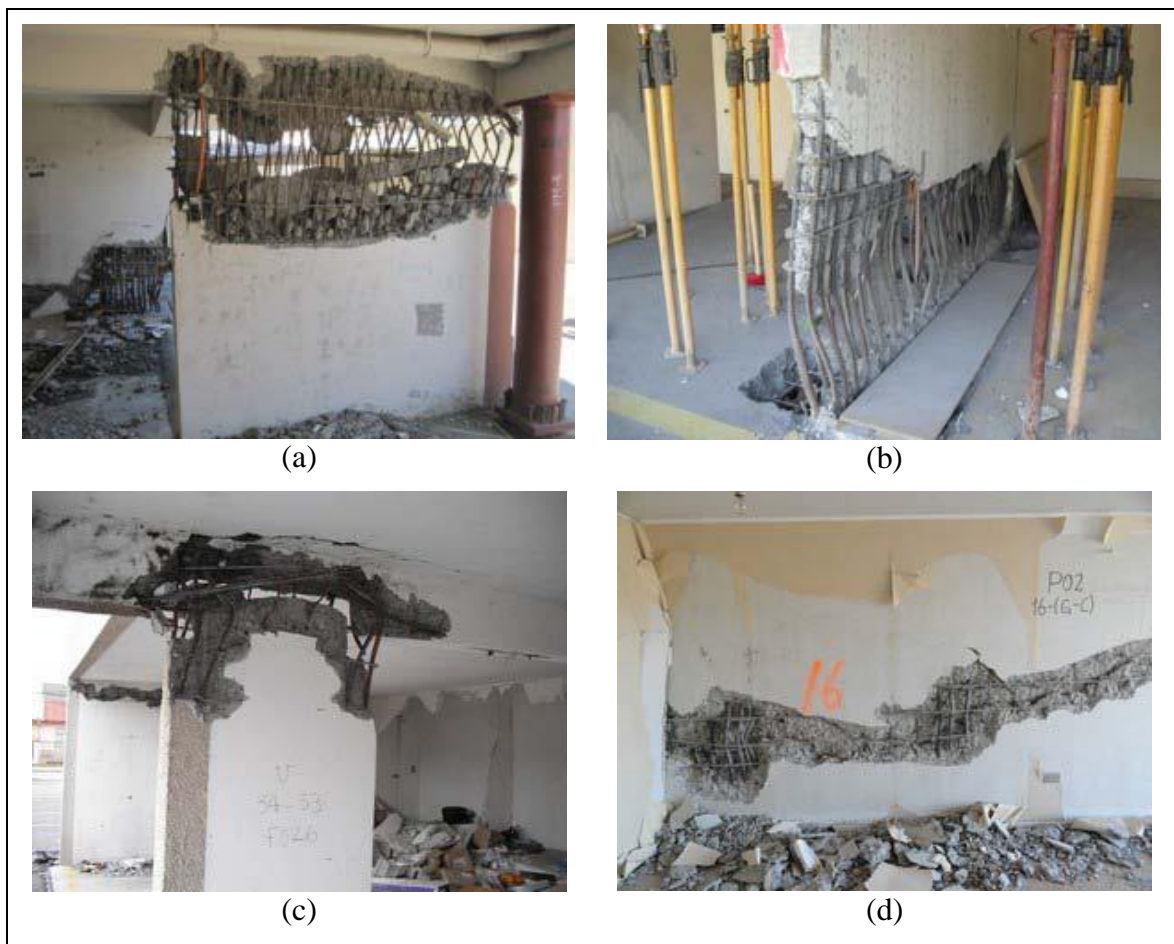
Damaged walls in (a) CM (b) AH (c) PR (d) AA buildings
